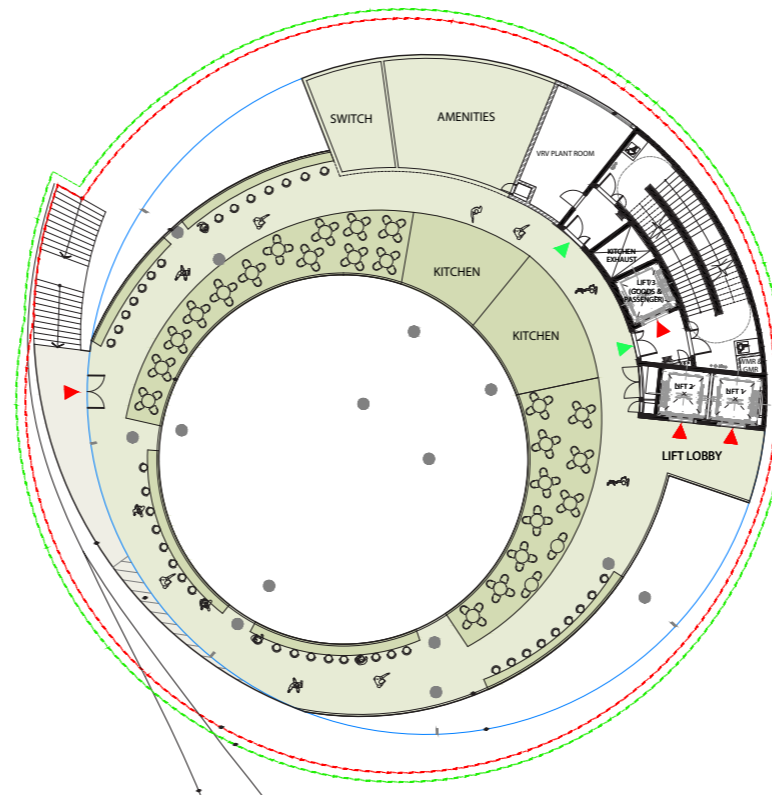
DA Mezzanine Plan (with indicative fit out)
